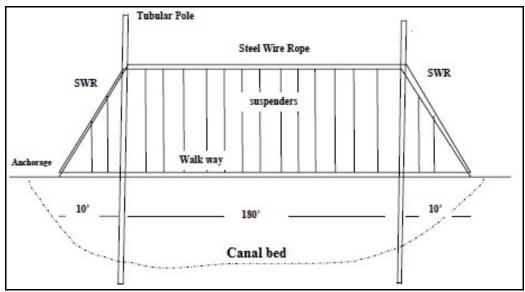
Typical design of a foot suspension bridge for Oussudu sanctuary
